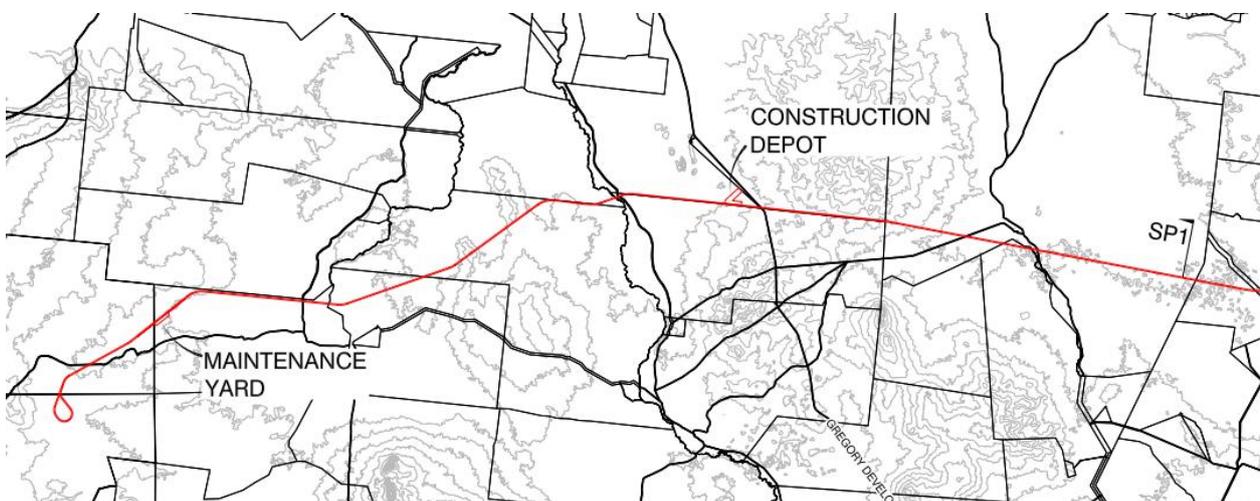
Plan showing proposed location of construction depot and maintenance yard
